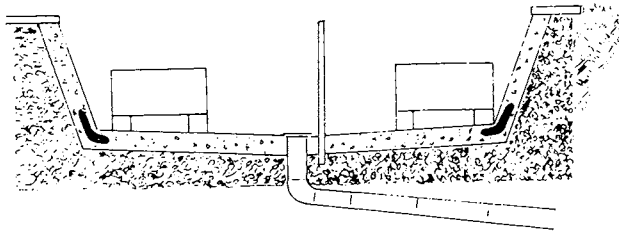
Reinforce concrete pool walls at the angles of the wall and floor.
